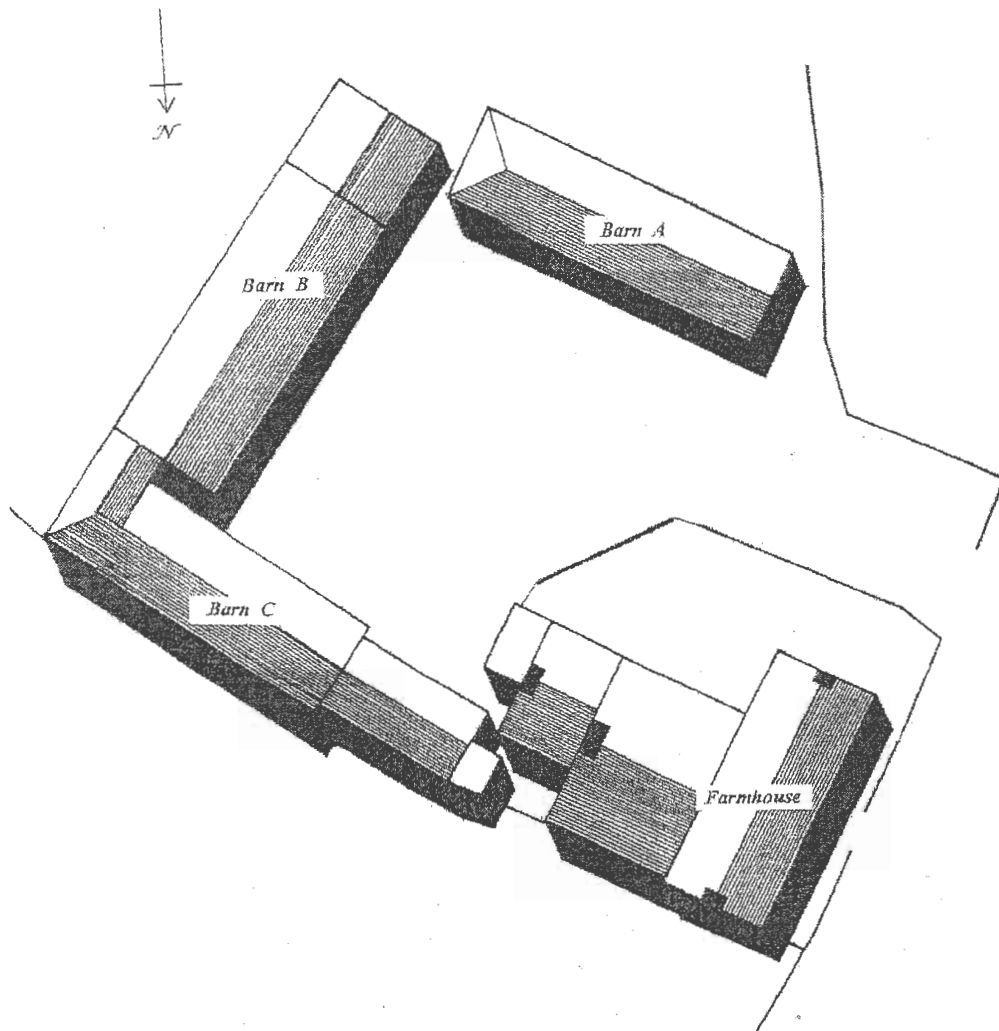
Ravenstone Farm, block plan layout of farm and outbuildings referred to in this report.
